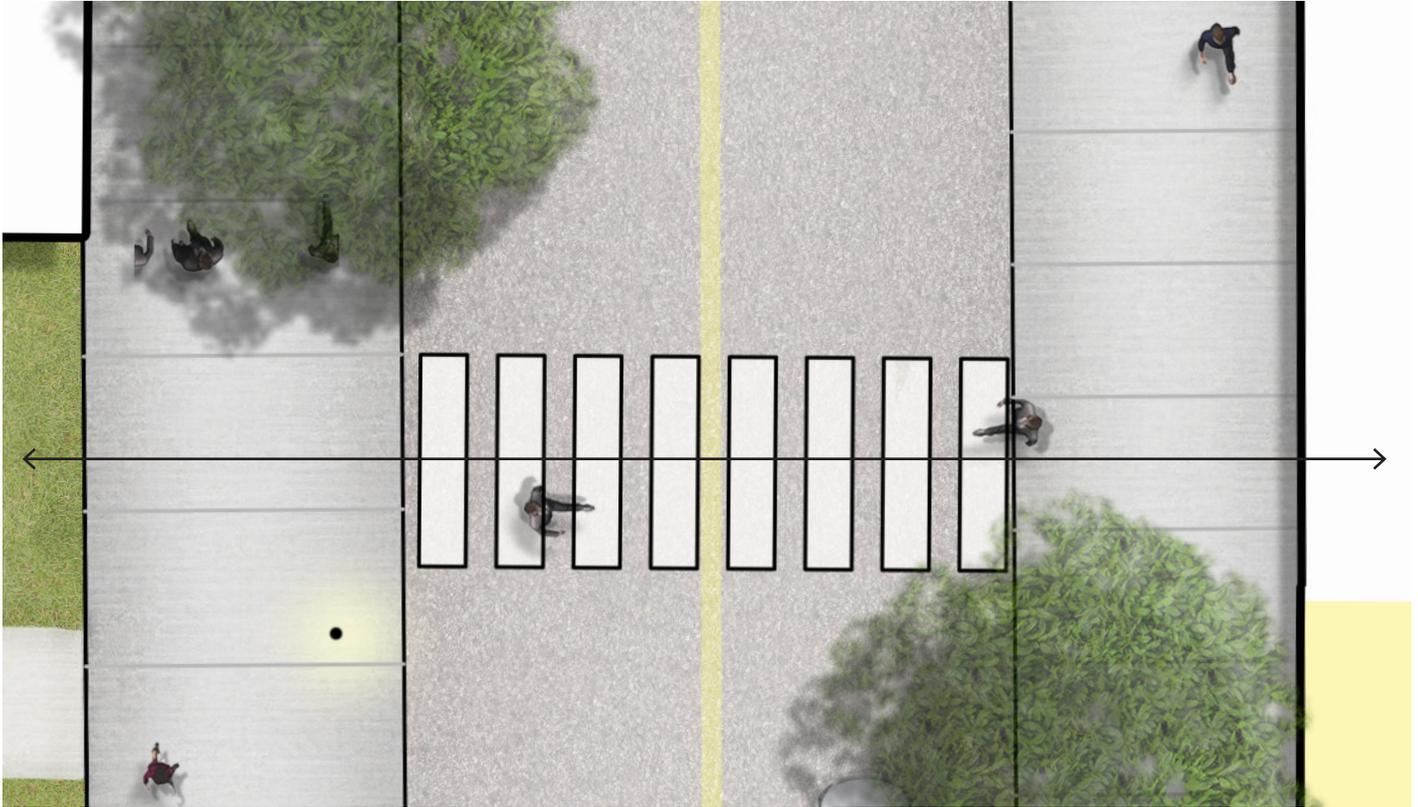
Section 1: Narrowed Roadway at Pedestrian Crossing
